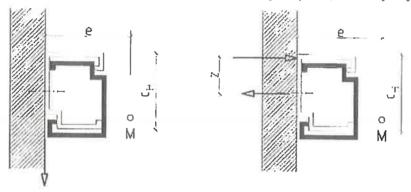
torsion of horizontal load-bearing profiles resulting from dead load of the façade panels
